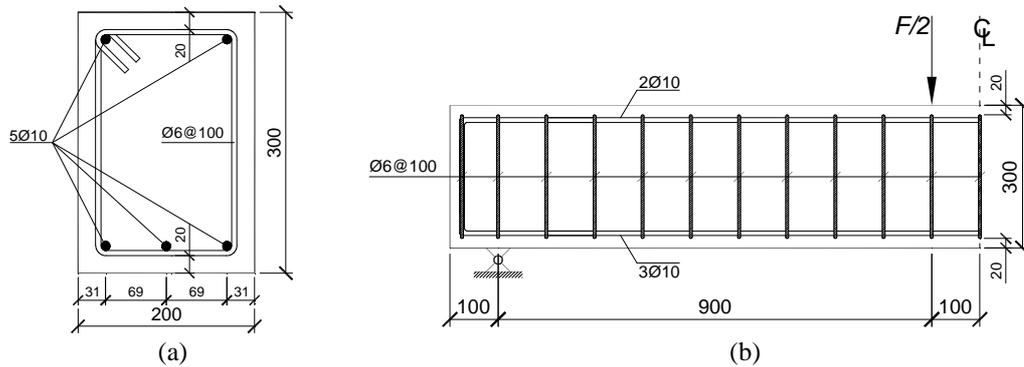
RC beams: (a) Cross section; (b) Longitudinal view. Note: all units in [mm].
